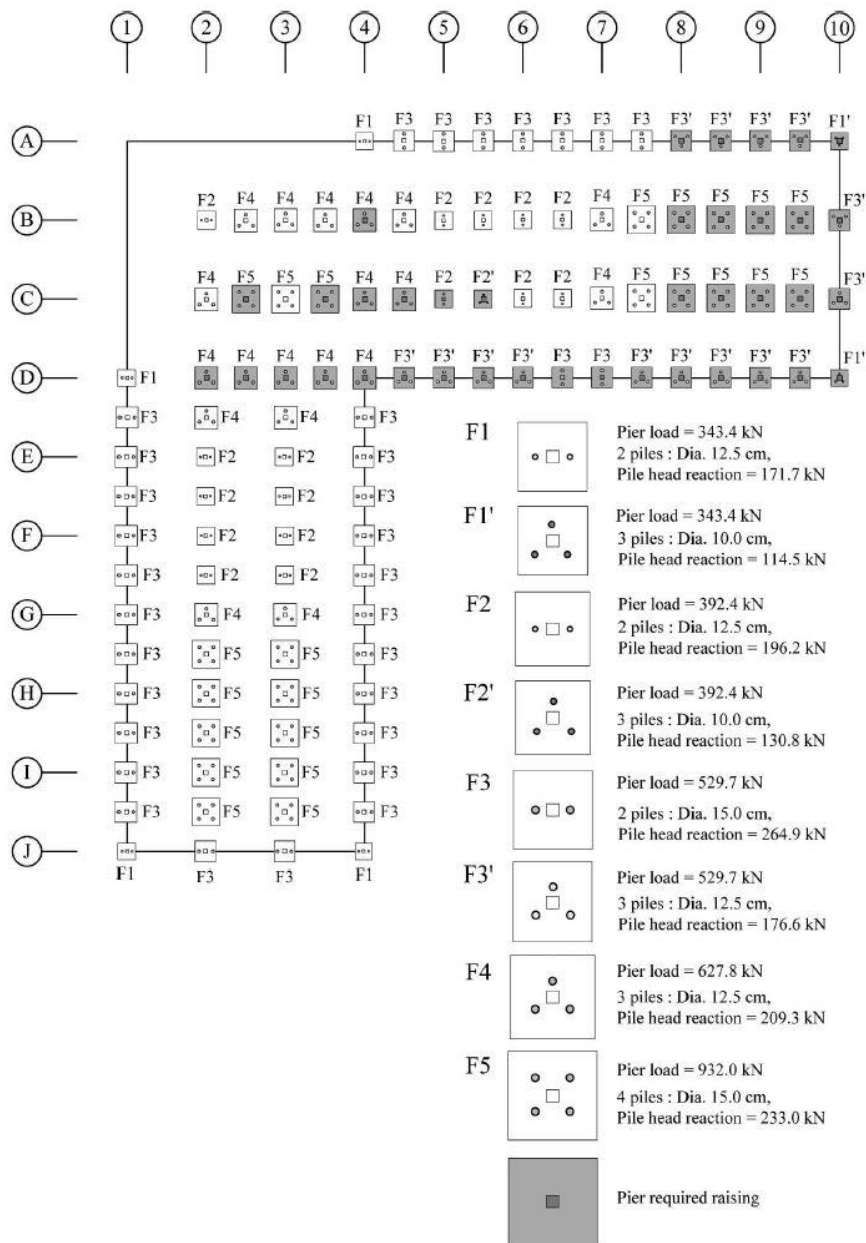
Plan view of underpinned foundations for Dormitory Suranivet 9 (Horpibulsuk et al., 2008)
